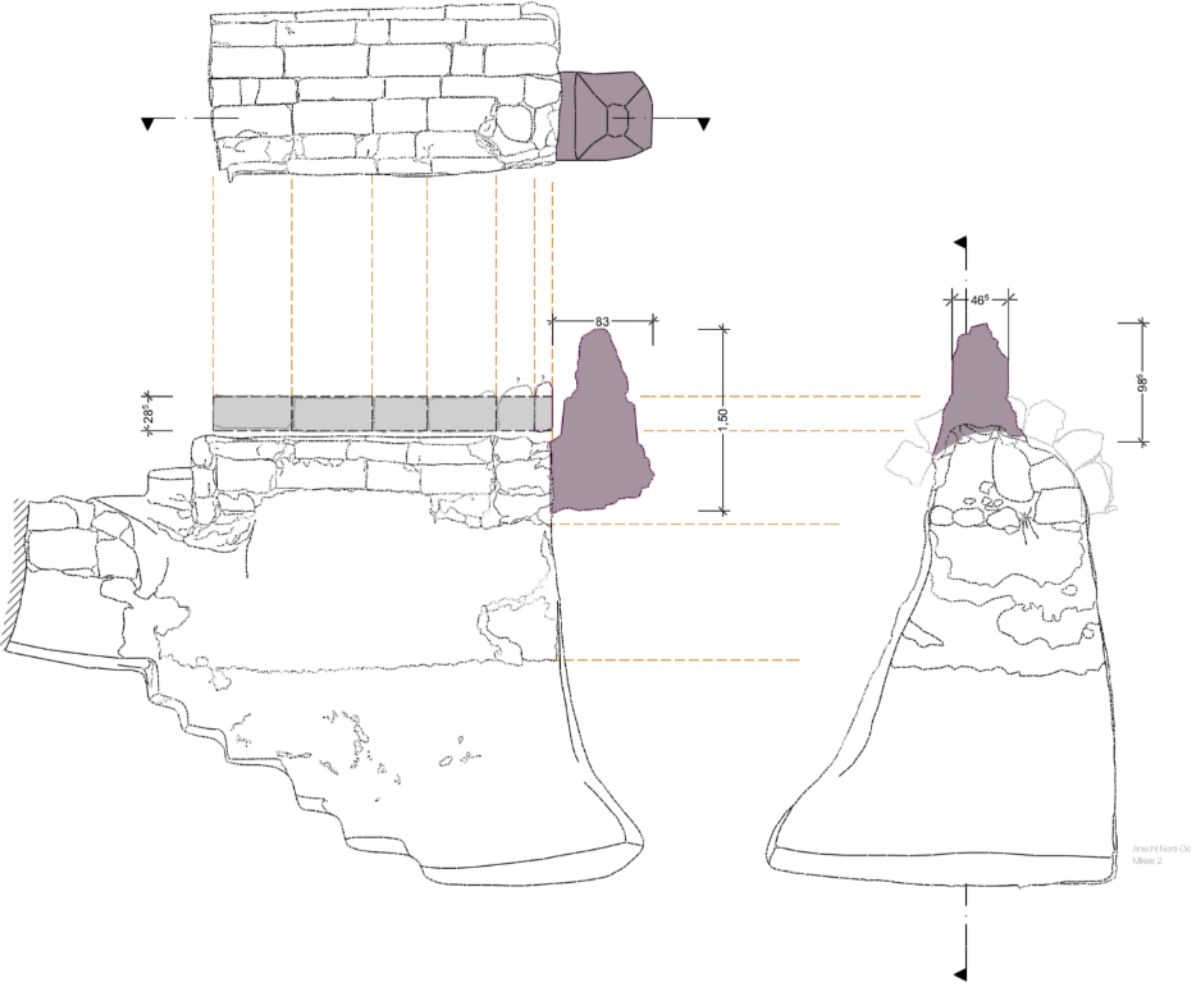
plan of northwestern Miqveh with cavity (note: drawing shows vault before the closing), plan: E. Thierry
